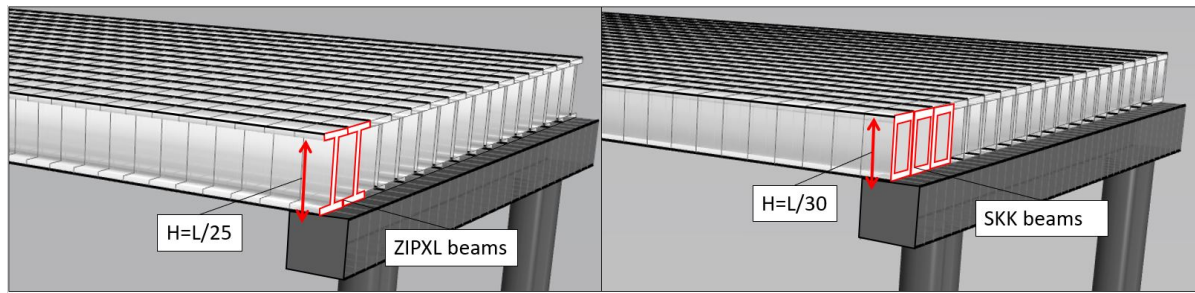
Approach bridge span with inverted-T or I-beams and box beams.
